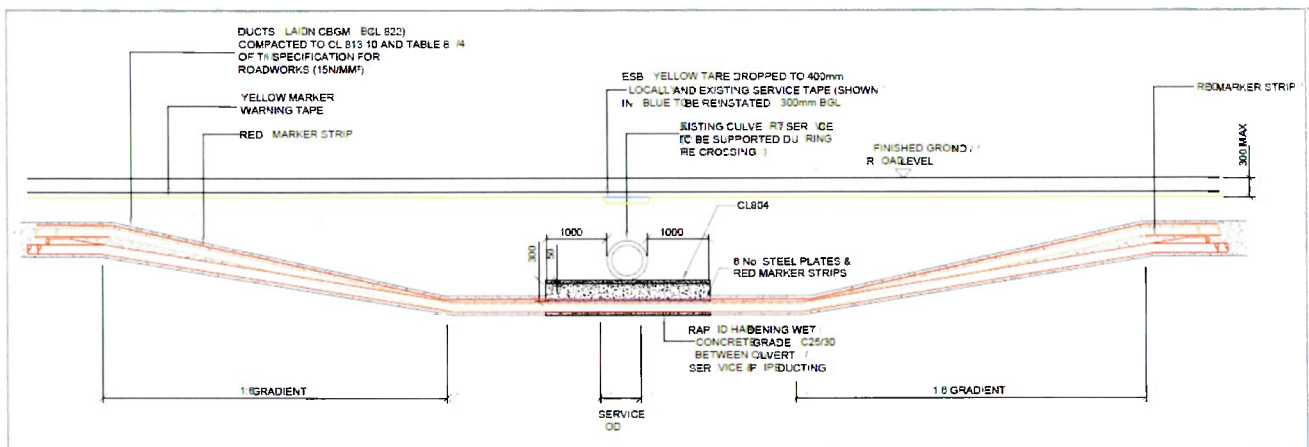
Typical 110kV UGC Culvert Undercrossing
